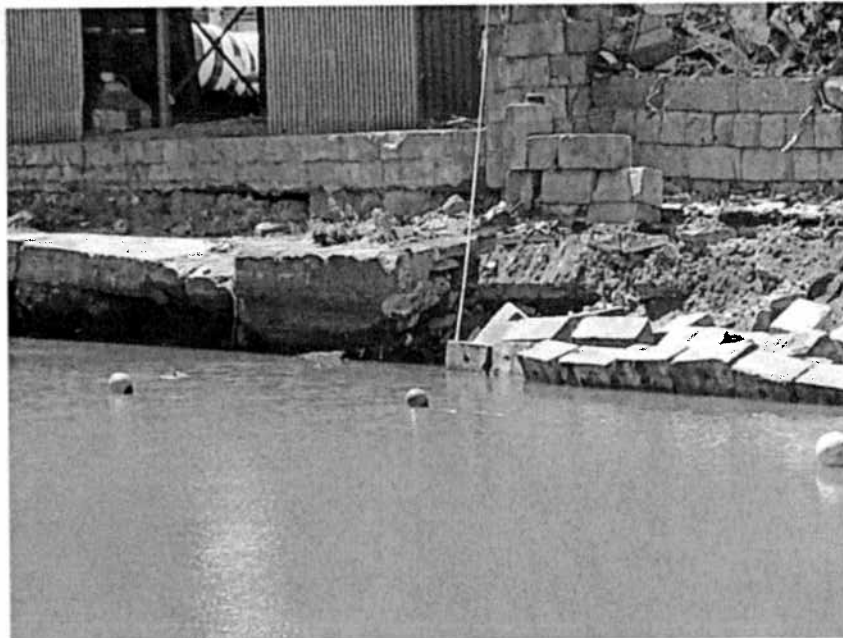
View of south end of collapse from Lowes parking lot across the canal.
